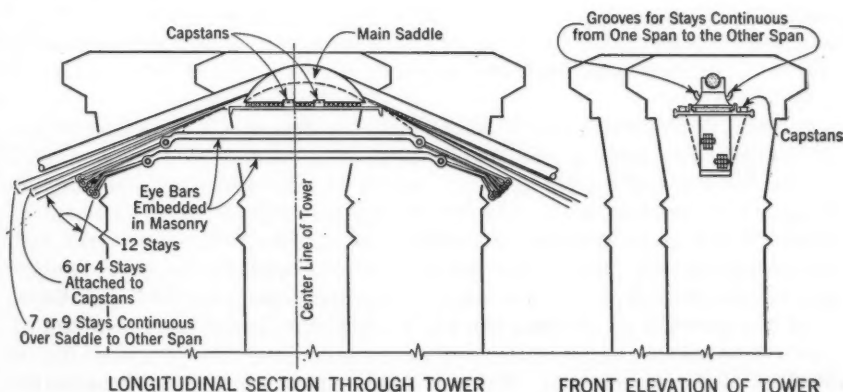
ARRANGEMENT OF OVERFLOOR STAYS AT THE TOWER TOPS
